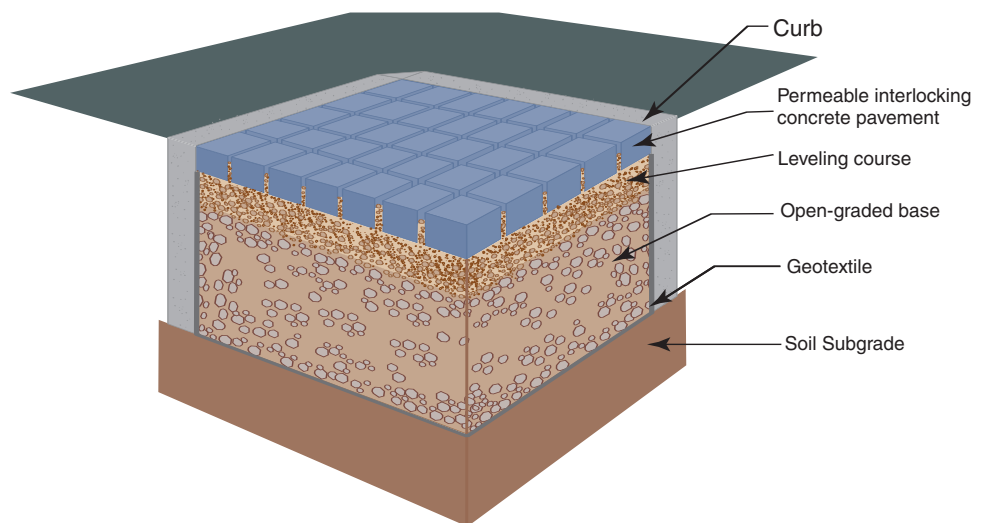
Typical components of a permeable interlocking concrete pavement: the base thickness will vary depending on the runoff storage requirements for a particular site.
